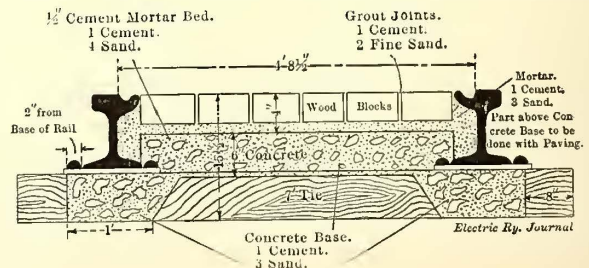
Boston Elevated Railway—Concrete Beam Construction for Moderate Traffic
